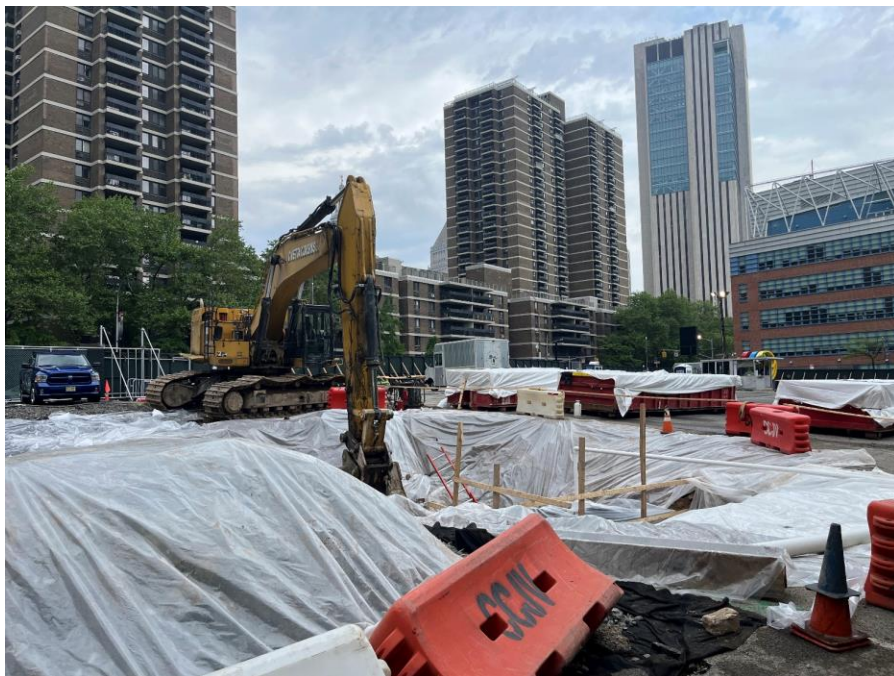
View of exposed soil/fill, imported 2.5-inch virgin stone, and roll-off containers covered with polyethylene sheeting at the end of the work day (facing northeast)
